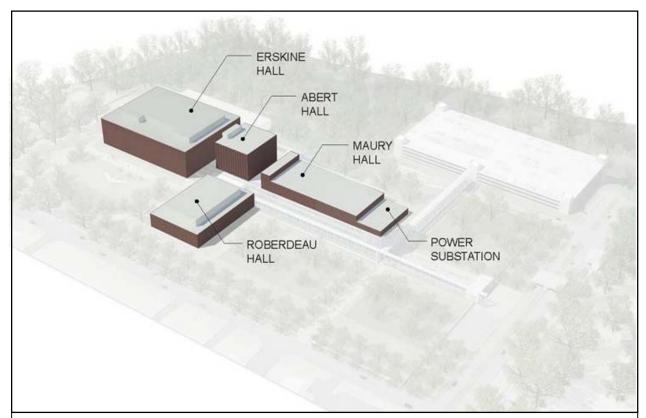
Existing building massing overlay on proposed development plan, (2011 Concept Rendering). Note final layout of parking garage has been modified to reduce size of parking facility to a maximum of 1,800 spaces and garage has been shifted to reduce potential impact to existing forested area of the site.
